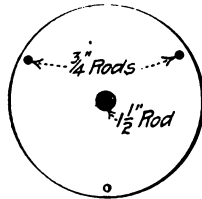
Reinforcement for Raymond Concrete Pile.
